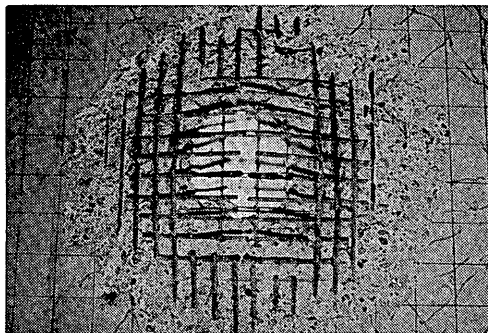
Elimination of Frustum of Core and Cutting Tension Reinforcement at Additional Loading Test (Slab XC-4)
